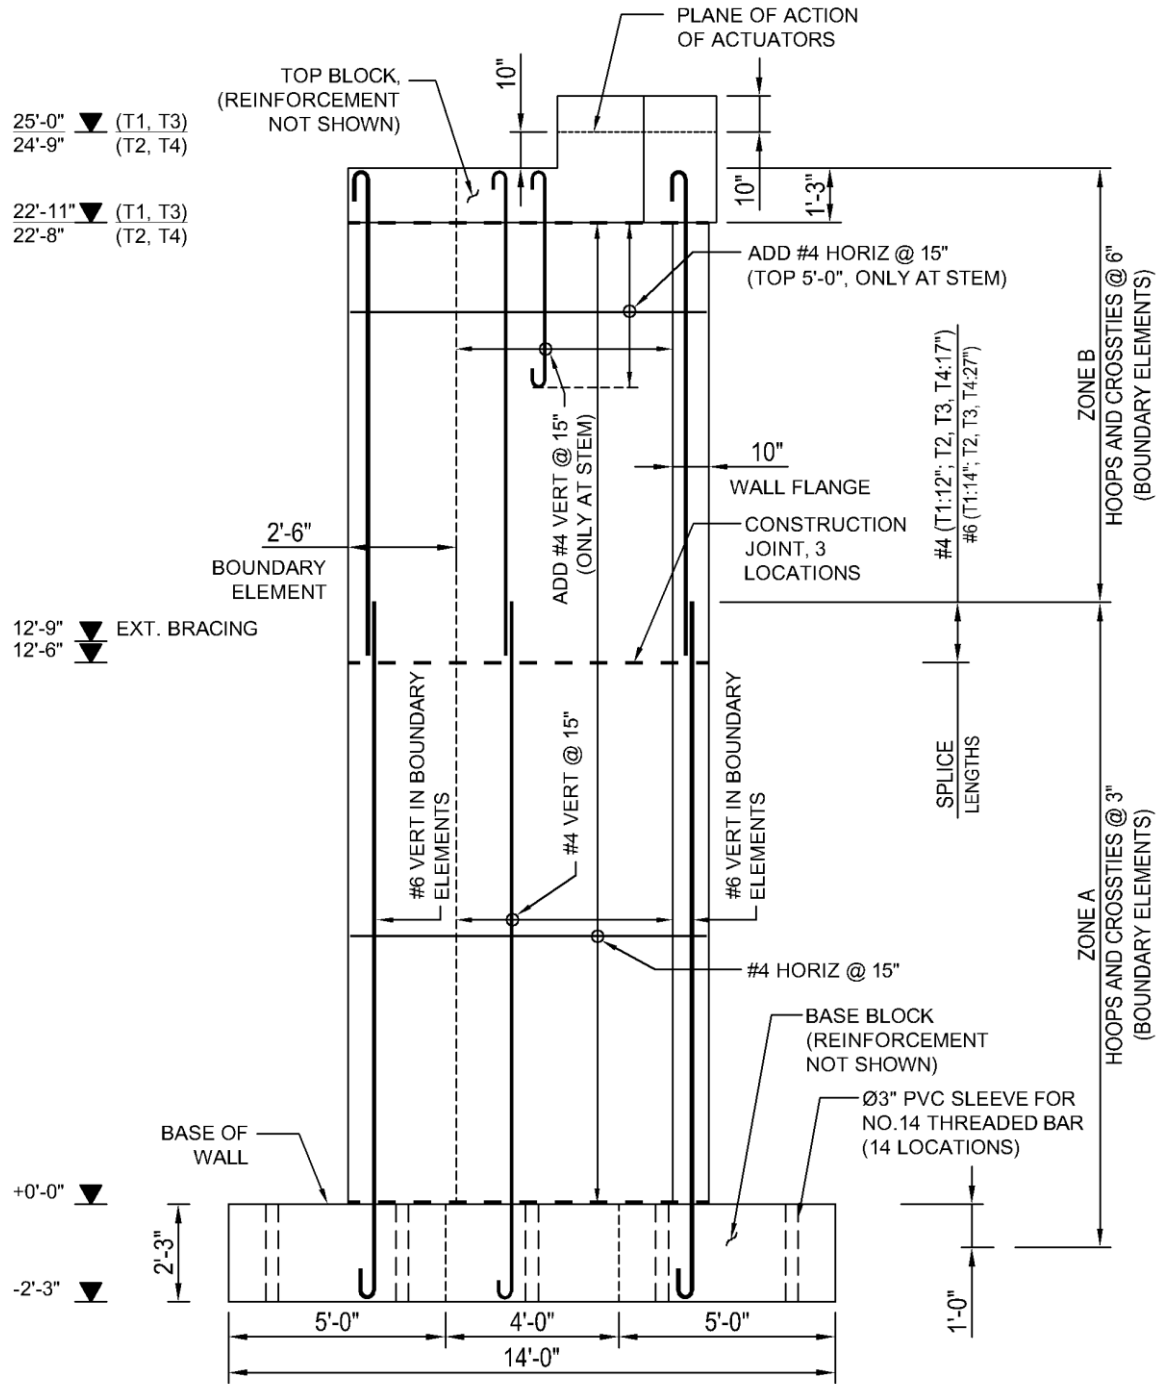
Typical wall elevation (1 in. = 25.4 mm)
